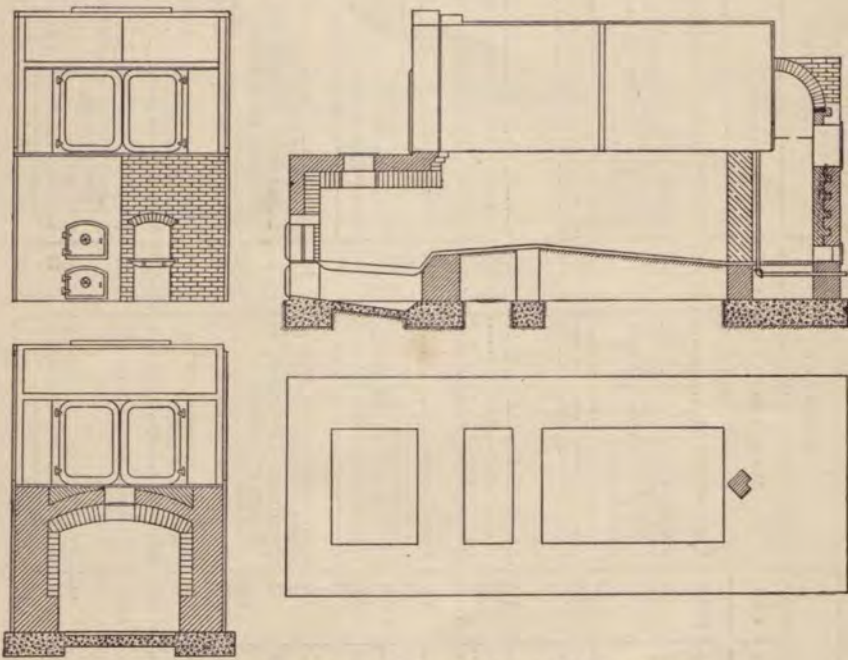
Boiler setting and furnace for burning bagasse or wood
